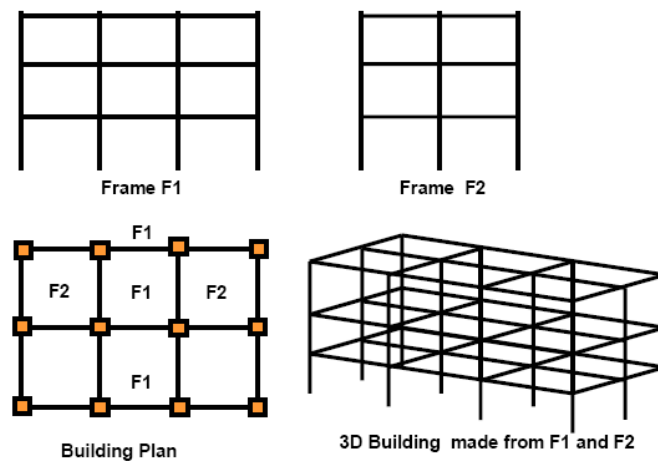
A 3D Building as a System of Two Typical 2D Frames
